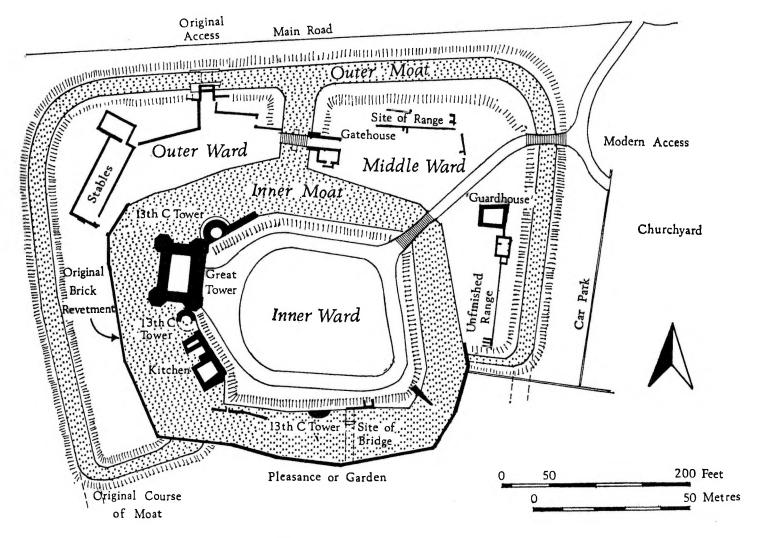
Plan of Tattershall Castle as existing in 1914. (after Thompson, 1988)
